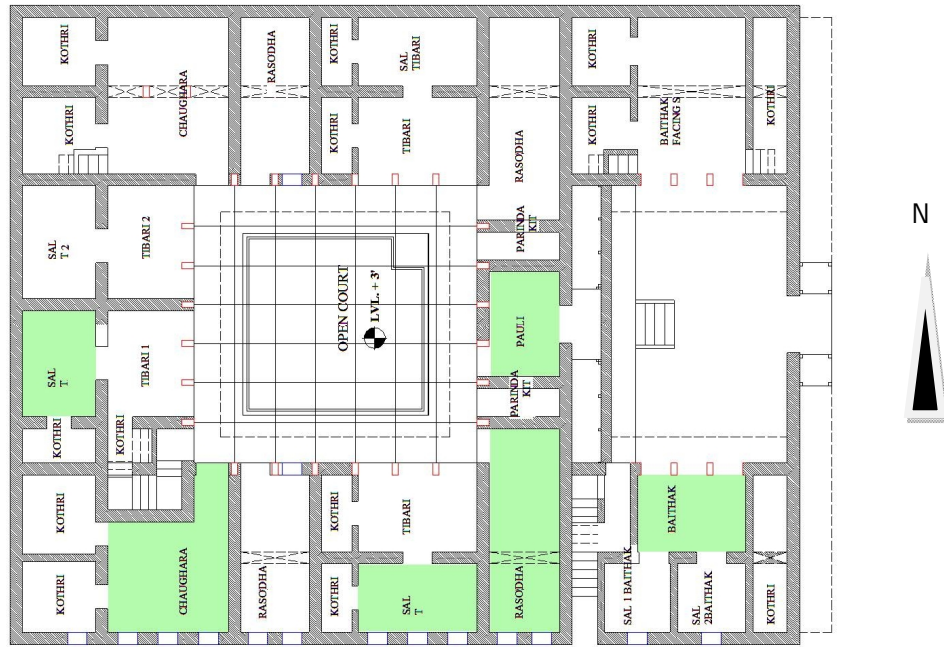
Upper Ground Floor Plan of a typical and Design Builder snapshot of modeled Haveli (Shaded areas are the ones which have been simulated for calculations)
